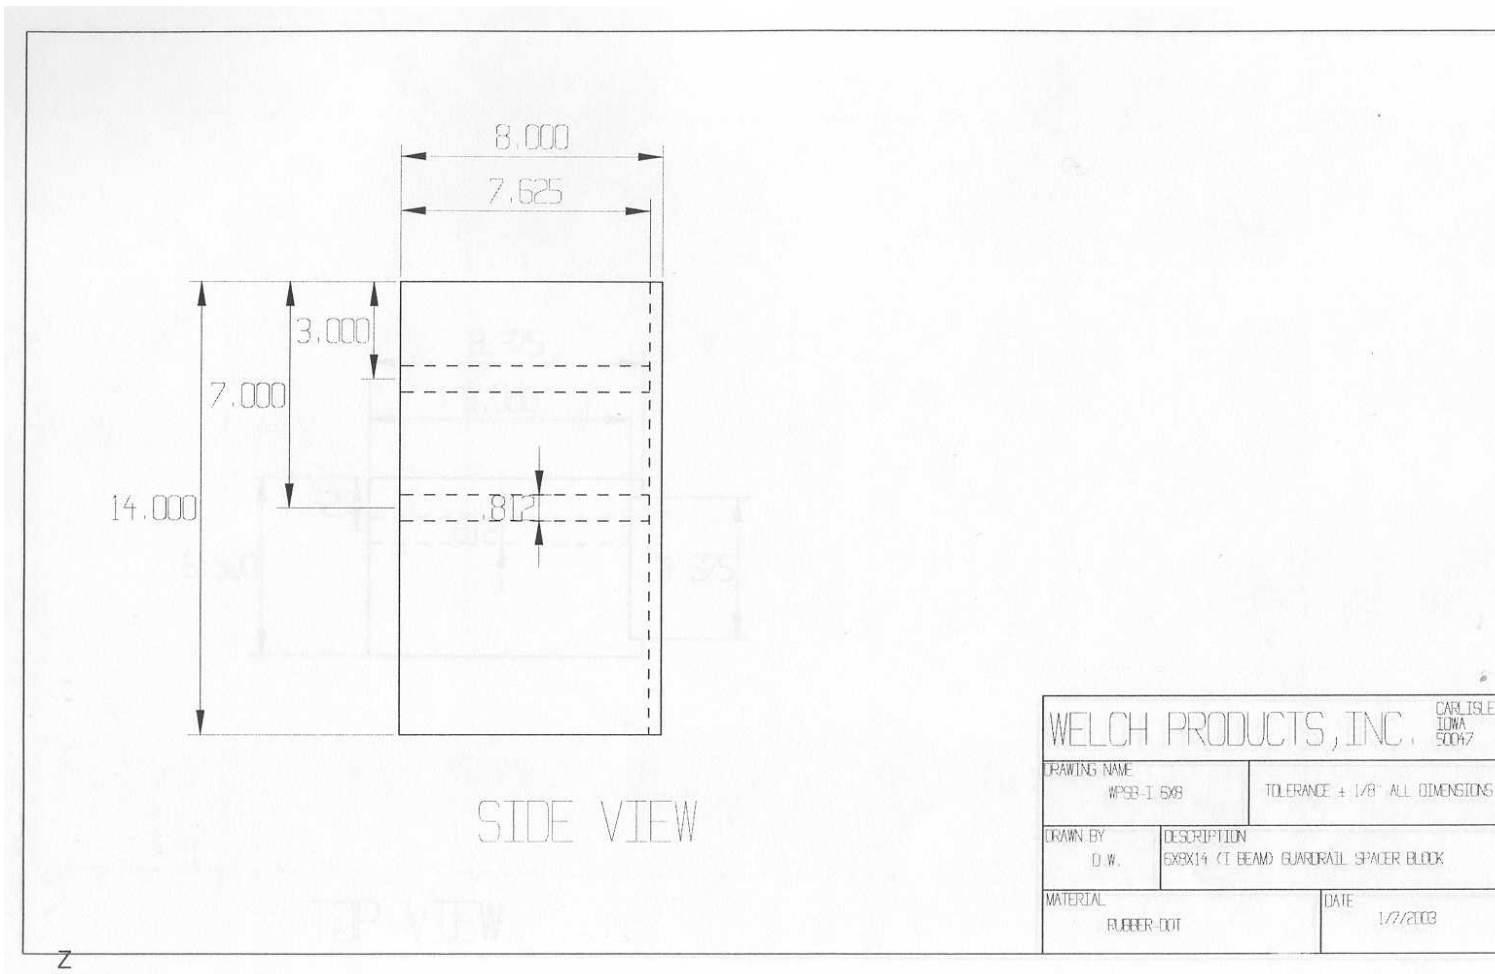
Recycled Rubber Spacer Block Details, Test WB-2
